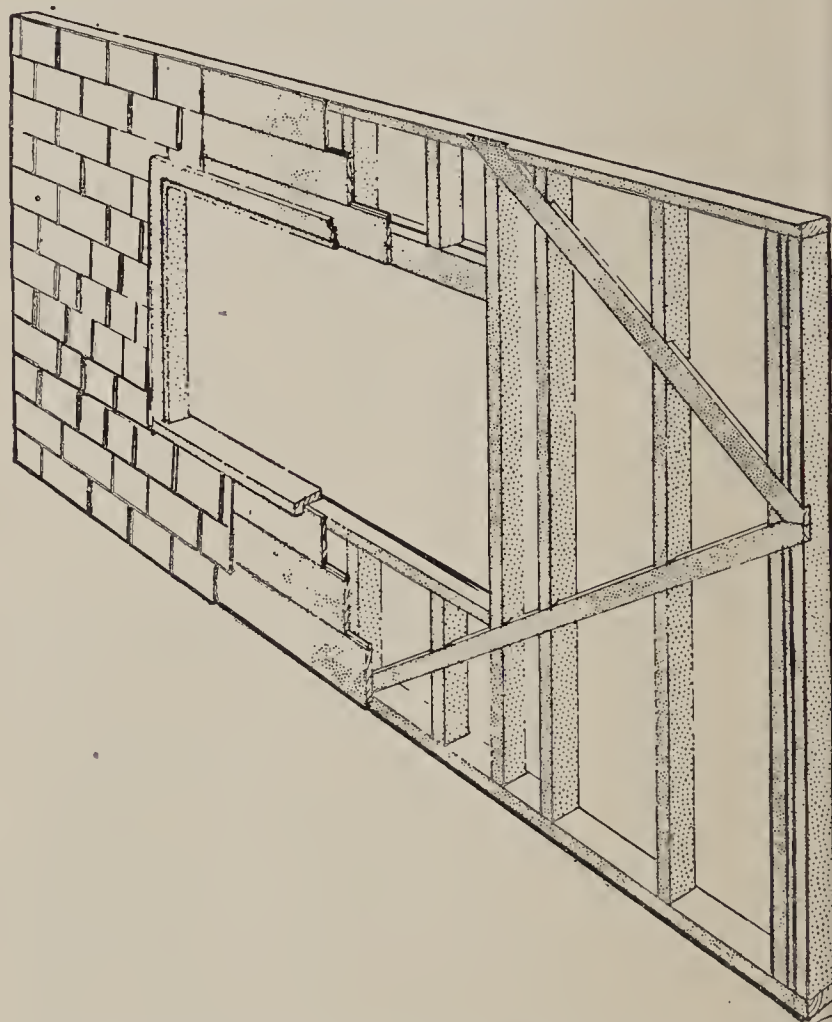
Nailed-construction wall section of room length, showing studding, bracing, sheathing, and exterior shingles.
